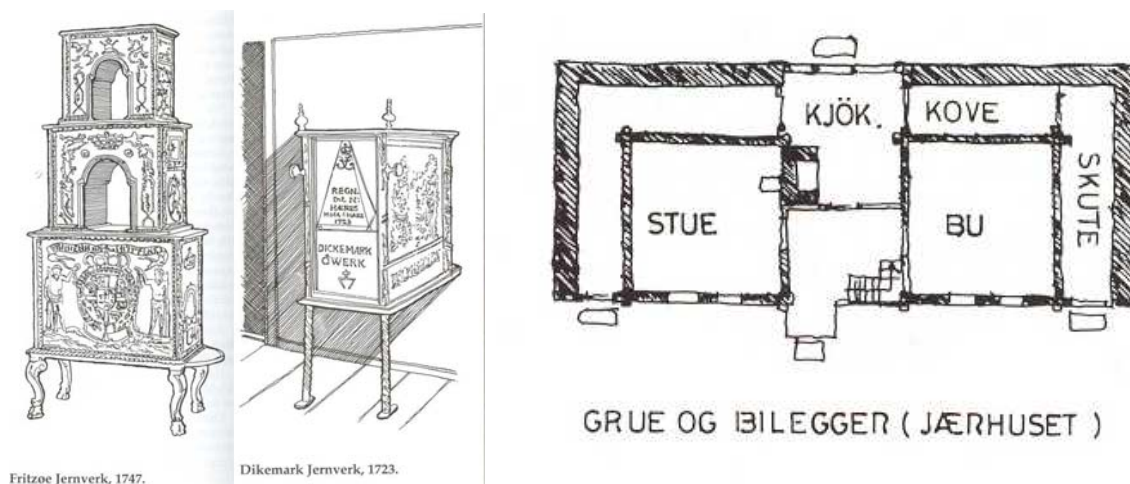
Wind stove, external firebox stove ("Bilegger") (www.riksantikvaren.no) and floor plan lay-out showing firebox in "stue" (living room) (Eilert Sundt 1862).
